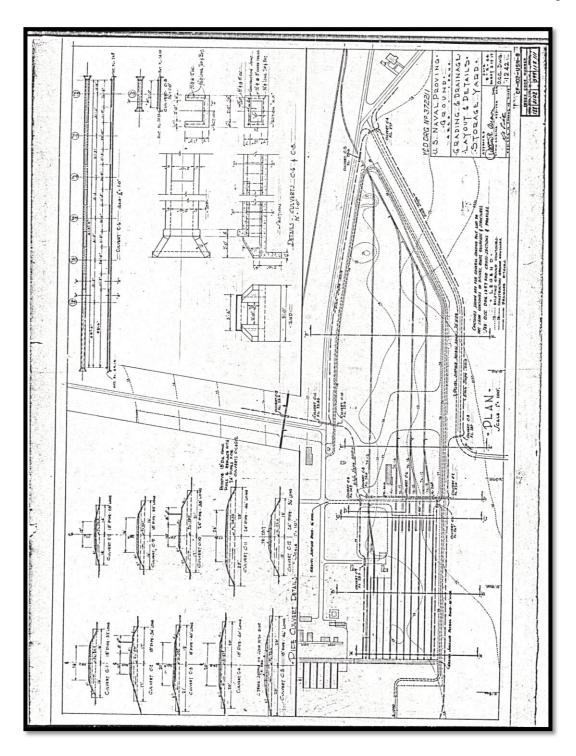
INL drawing number 112111 (CF-102-USN-8); storage yard, layout and details, grading and drainage; sheet 2 of 17; August 1944.
